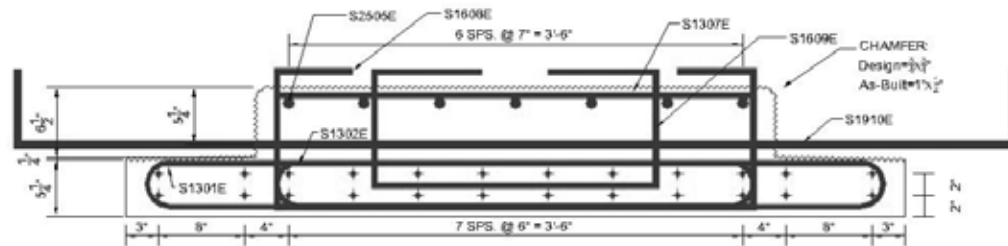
12: As-built cross section and reinforcement details for west end of Beam 2S
